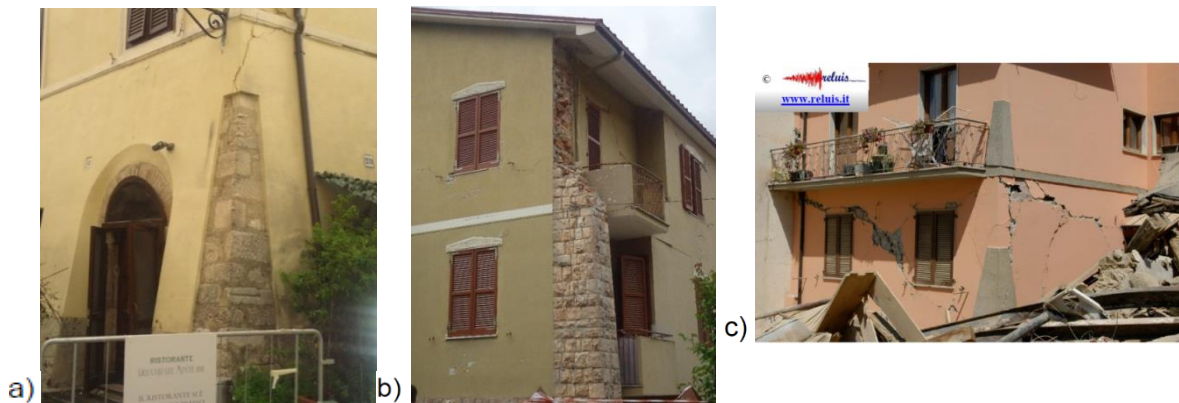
Buttress a) and b) in Norcia and c) in Amatrice In a) the reinforcement prevented the spreading of cracks. c) severe in plane and out of plane damages
